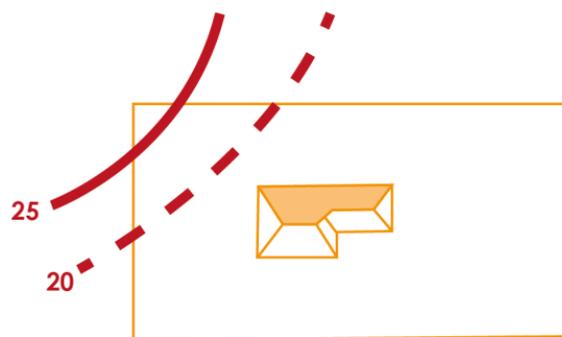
Figure BJ: Building Site Acceptability based on ANEF Zone
